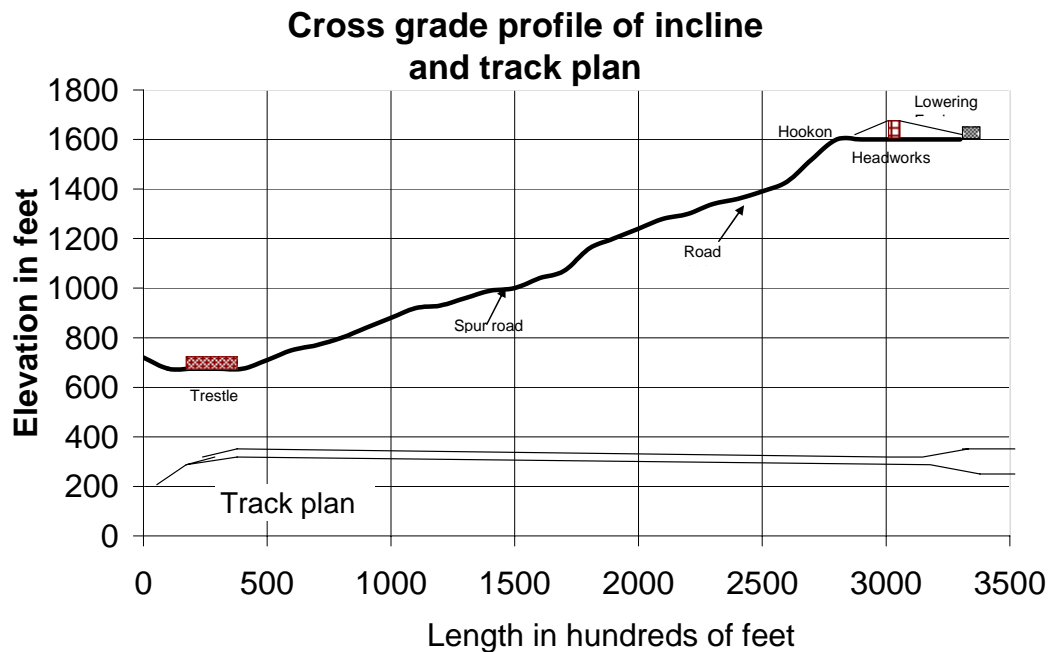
Cross-section and track plan of the Porter-Carstens incline.
